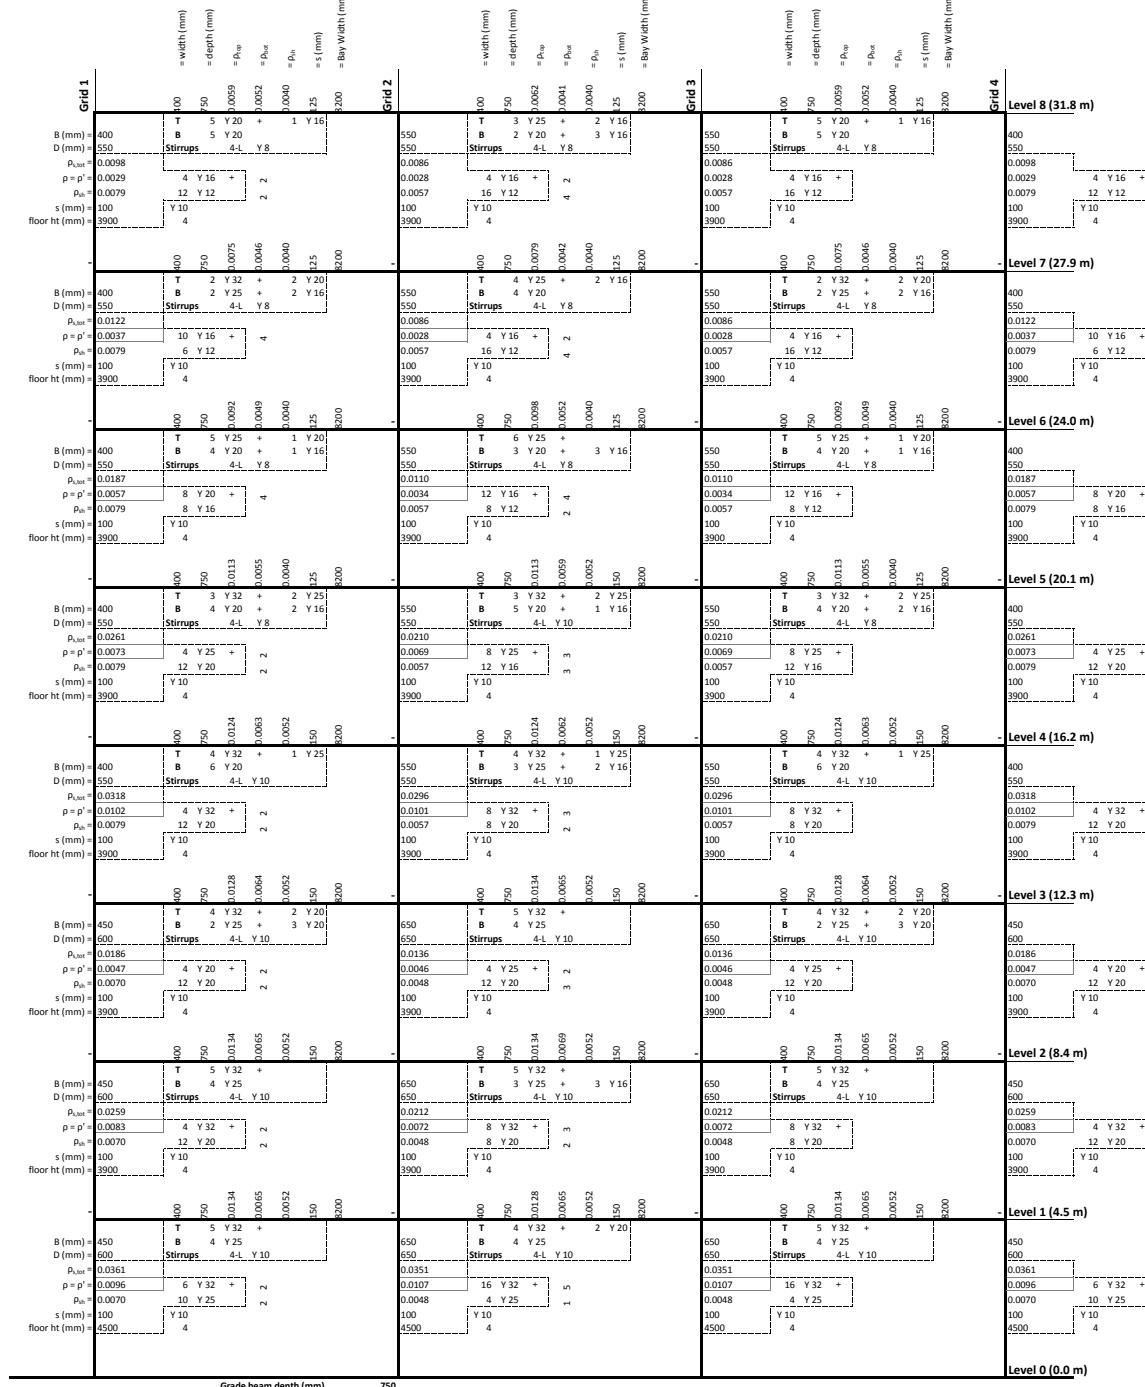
Provided reinforcement and modeling details for building ID 2457
